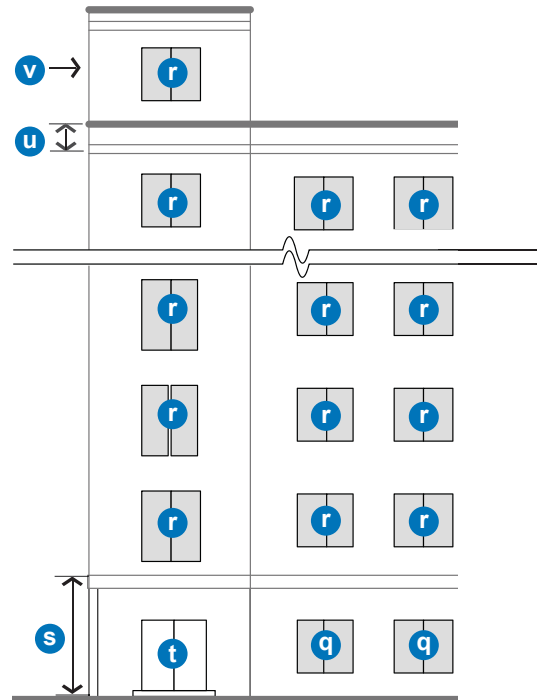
(3) General Stoop Building: Street Facade Requirements
